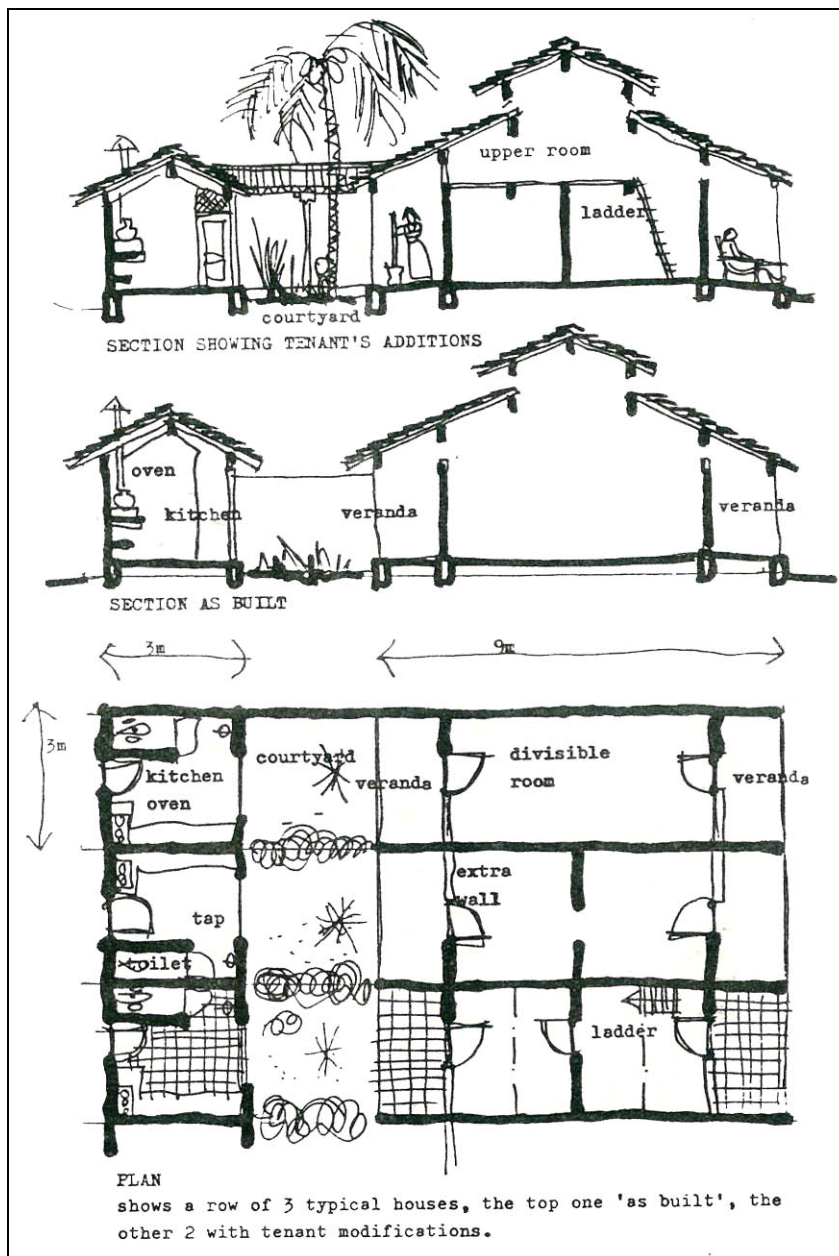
Standard House Scheme and Tenant's additional Design Scheme⁵⁶
